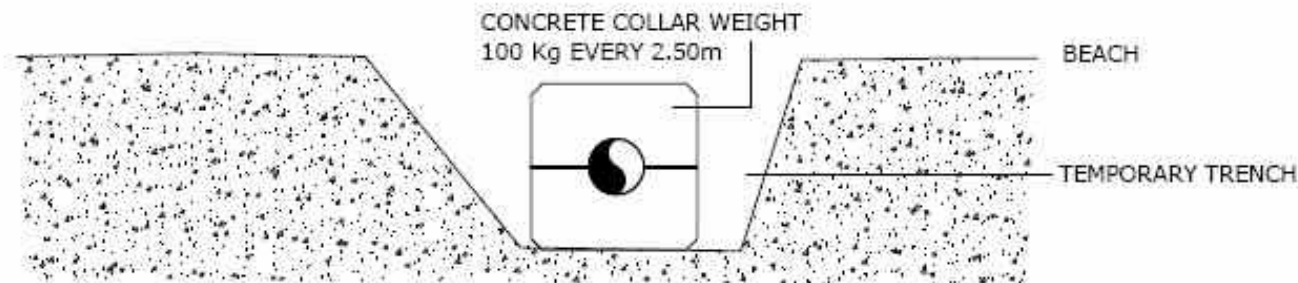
Section across outfall buried in sandy beach at the shoreline
